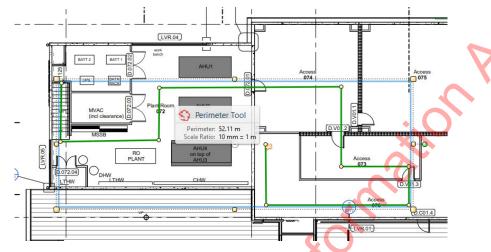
Excerpt from architectural drawing A-1002 showing means of escape from first floor plant room
